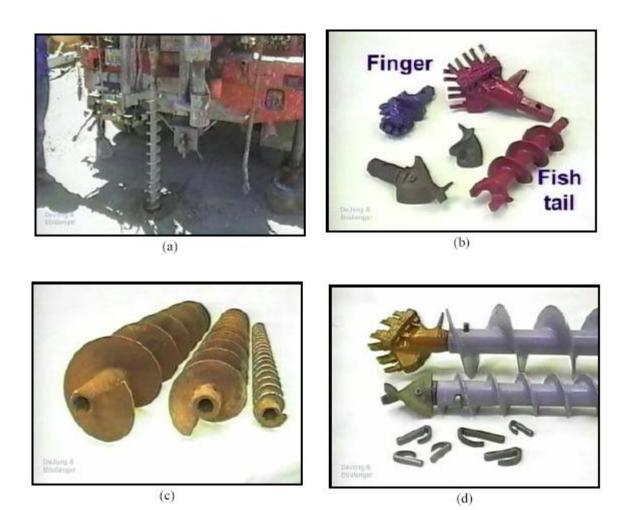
Solid Stem Continuous Flight Auger Drilling System: (a) In use on drill rig, (b) Finger and fishtail bits, (c) Sizes of solid stem auger flights, (d) Different assemblies of bits and auger flights. (All pictures in the above format are courtesy of DeJong and Boulanger, 2000)
